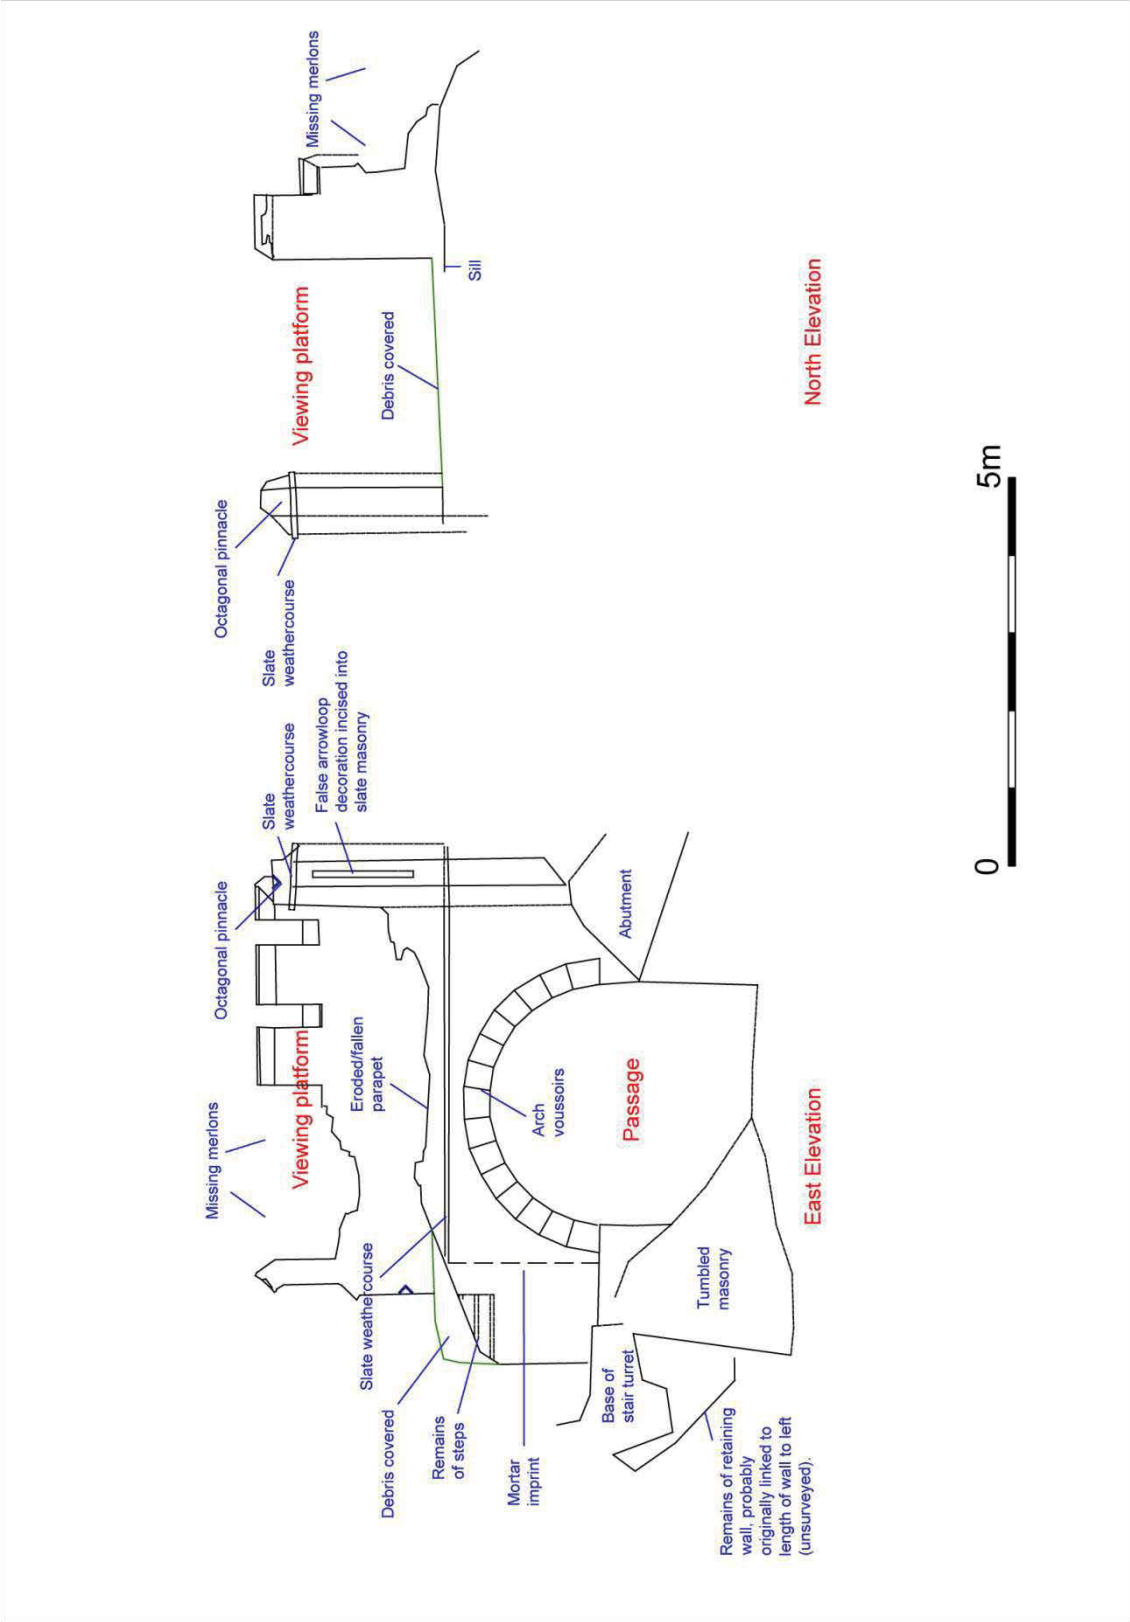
Battery Arch east and north elevations, prior to renovation works.
